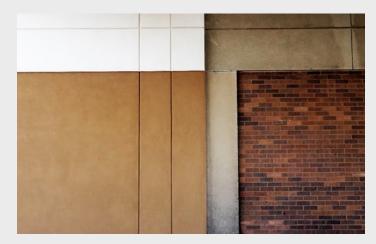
Completed overclad area of the EIFS adjacent to the existing masonry exterior wall.
